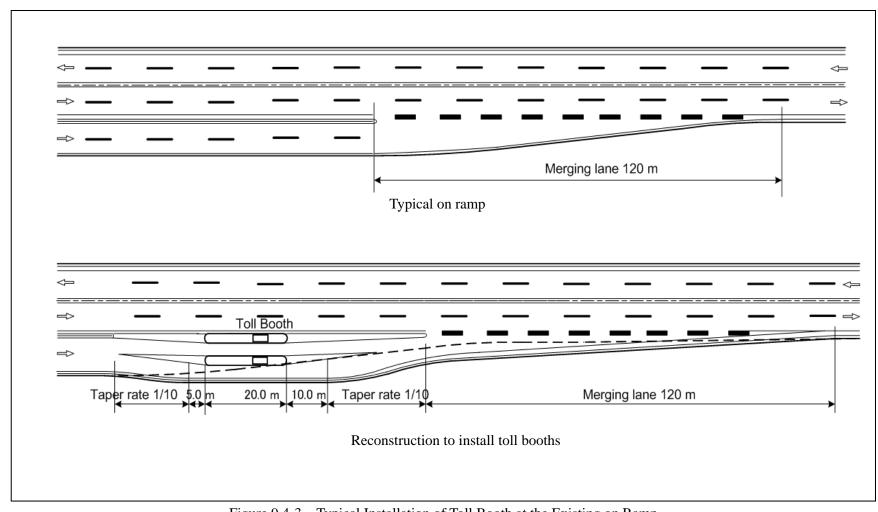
Typical Installation of Toll Booth at the Existing on Ramp
